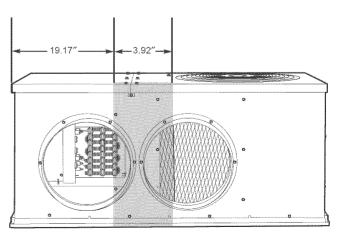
Area Not to be Drilled More than ³/₄-in.
